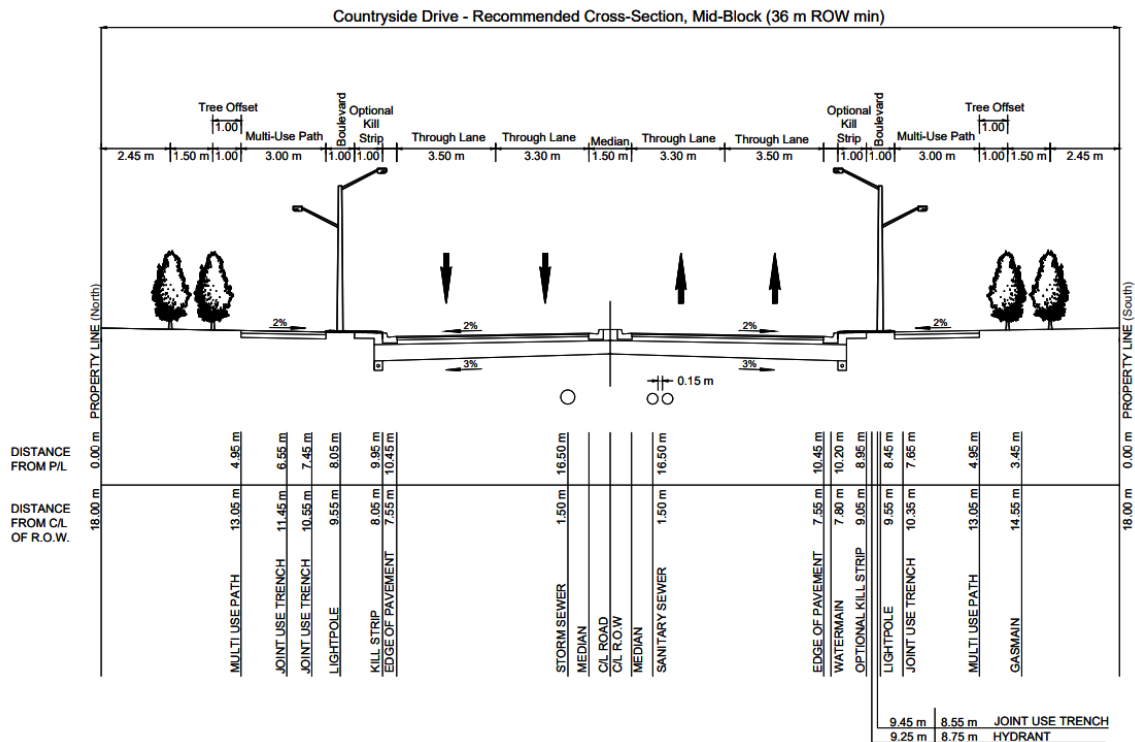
Recommended Cross-Section for the Countryside Drive (West of Arterial A2)
